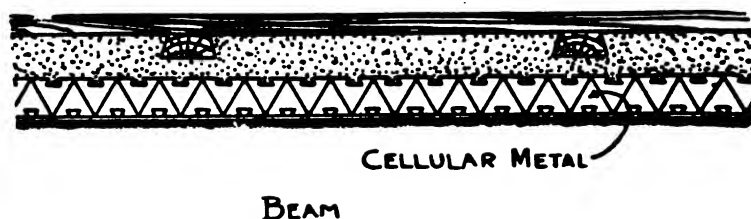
SECTION CONCRETE SLAB ON CELLULAR METAL, WOOD FLOOR ON SLEEPERS
